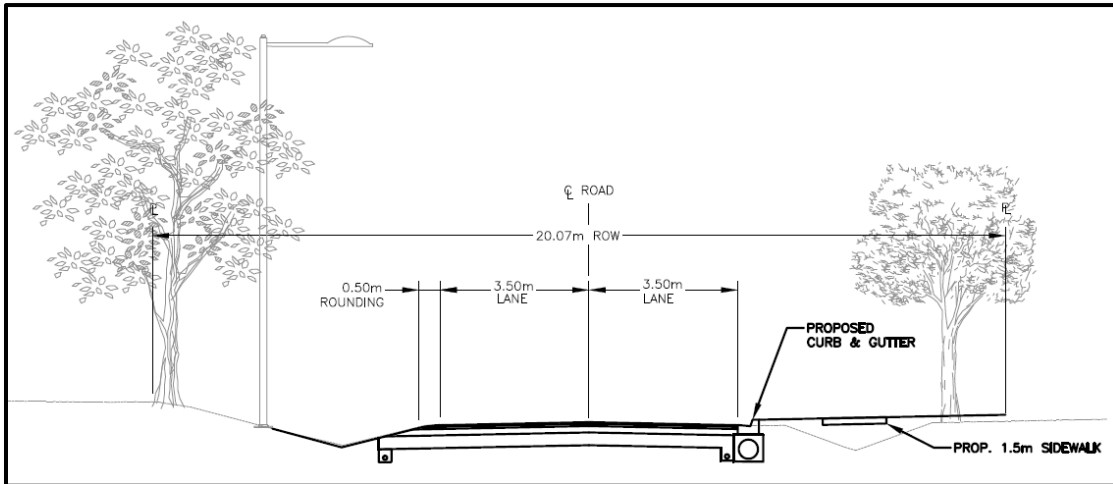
Proposed sidewalk south side Pickering Beach Road to Ruthel Road
